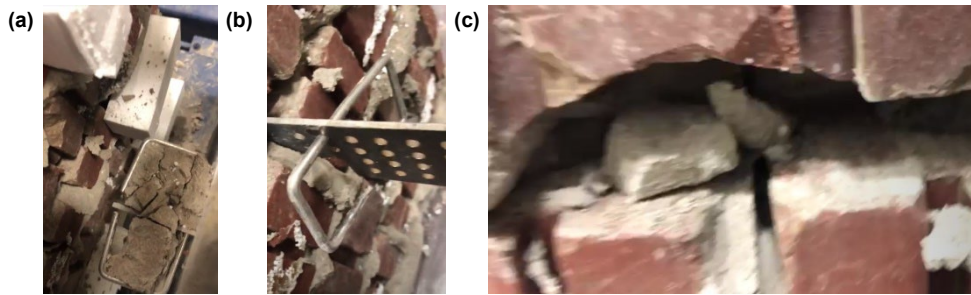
T-PV.CL-3 after testing of (a) embedment tie veneer failure, (b) tie connector condition, (c) horizontal mortar joint condition after removal of connector
